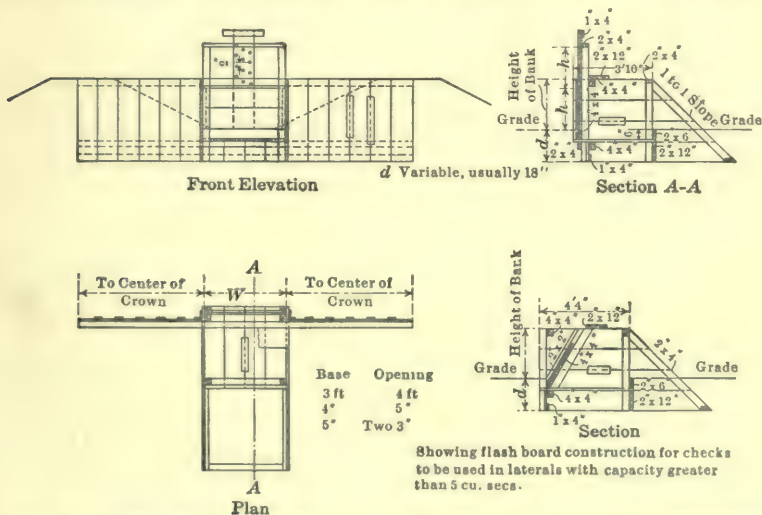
Single wall checkgate with sidewalls and floor. Sacramento Valley Irrigation Co., Cal.
